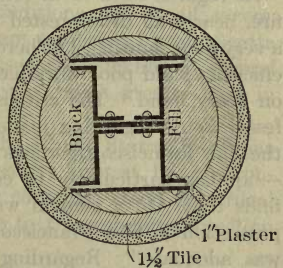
Column Protection, Herald Building, Baltimore Fire.
